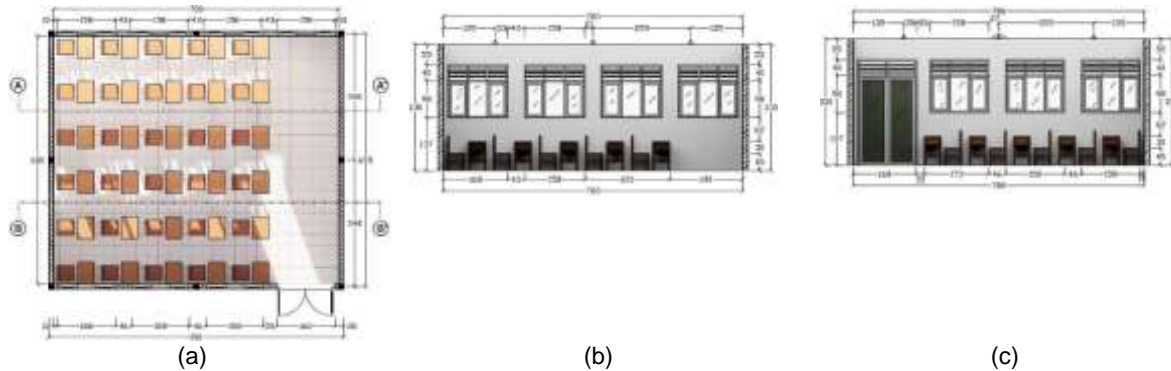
XII Nursing 1 Classroom (a) Layout, (b) Section A-A', and (c) Section B-B'
